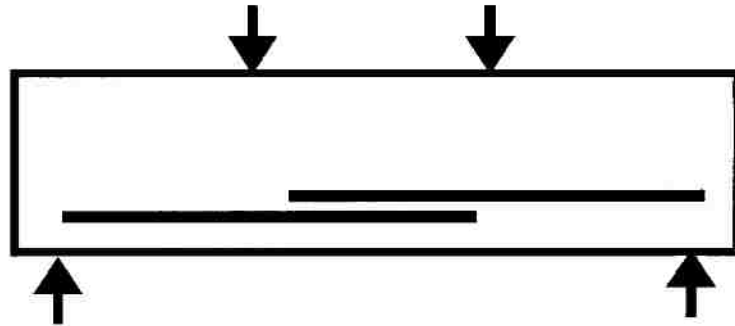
Splice Beam Specimen (ACI 408R, 2003)
